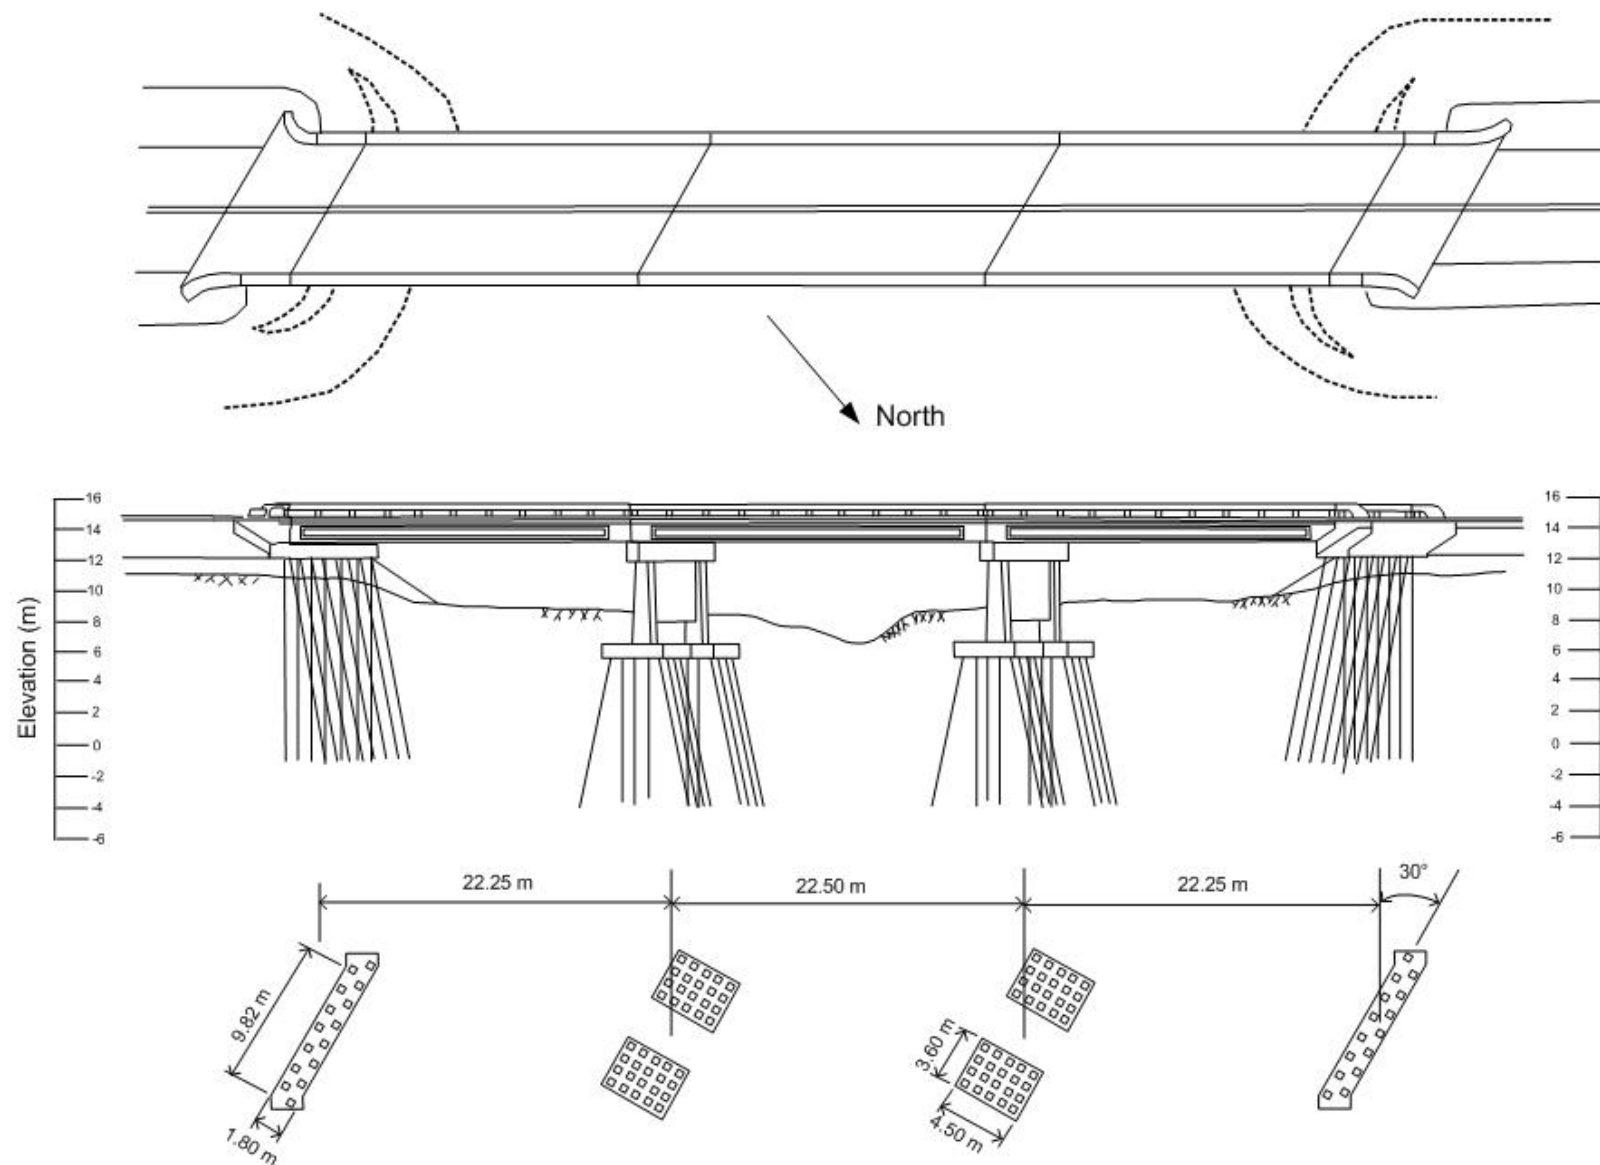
Simplified sketch of the plan and profile views of the Rio Cuba Bridge as shown on the bridge plans provided by the Costa Rican Ministry of Transportation
